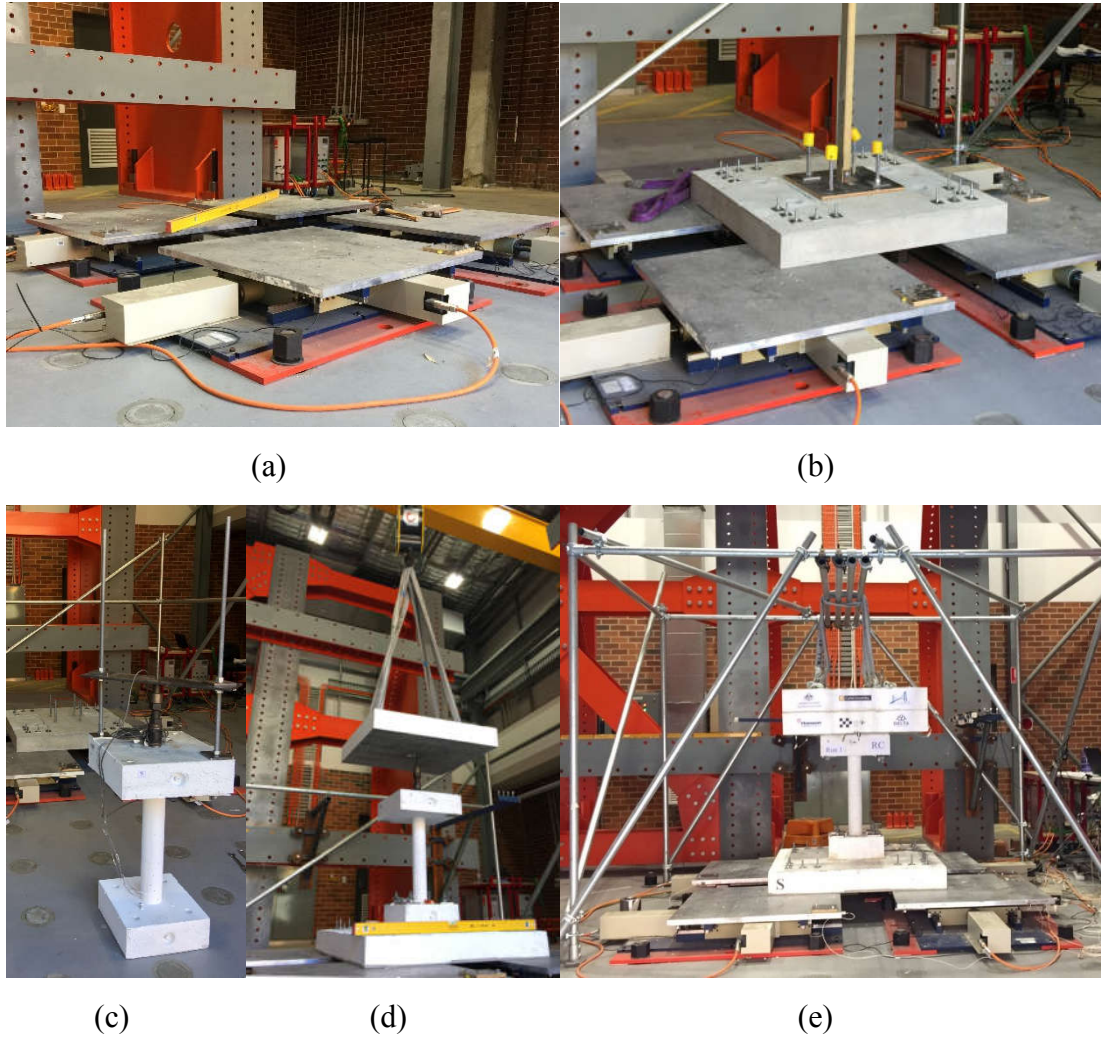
(a) Shake tables alignment and levelling, (b) base concrete block installed, (c) column ready to be installed, (d) installation of the mass blocks, (e) final setup of the column
